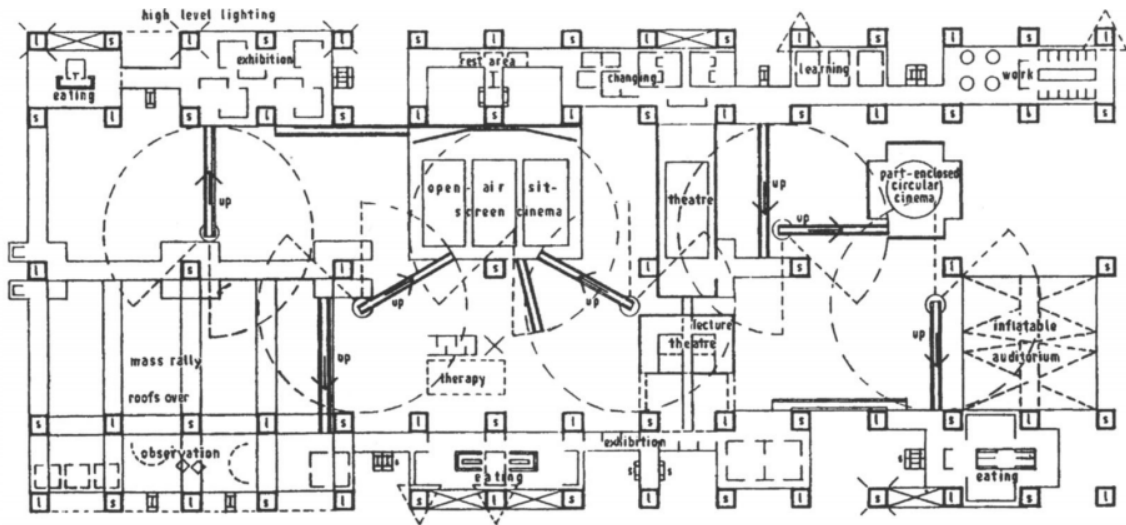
Fun Palace floor plan, 1964. Cedric Price Archives, Canadian Centre for Architecture, Montréal.
